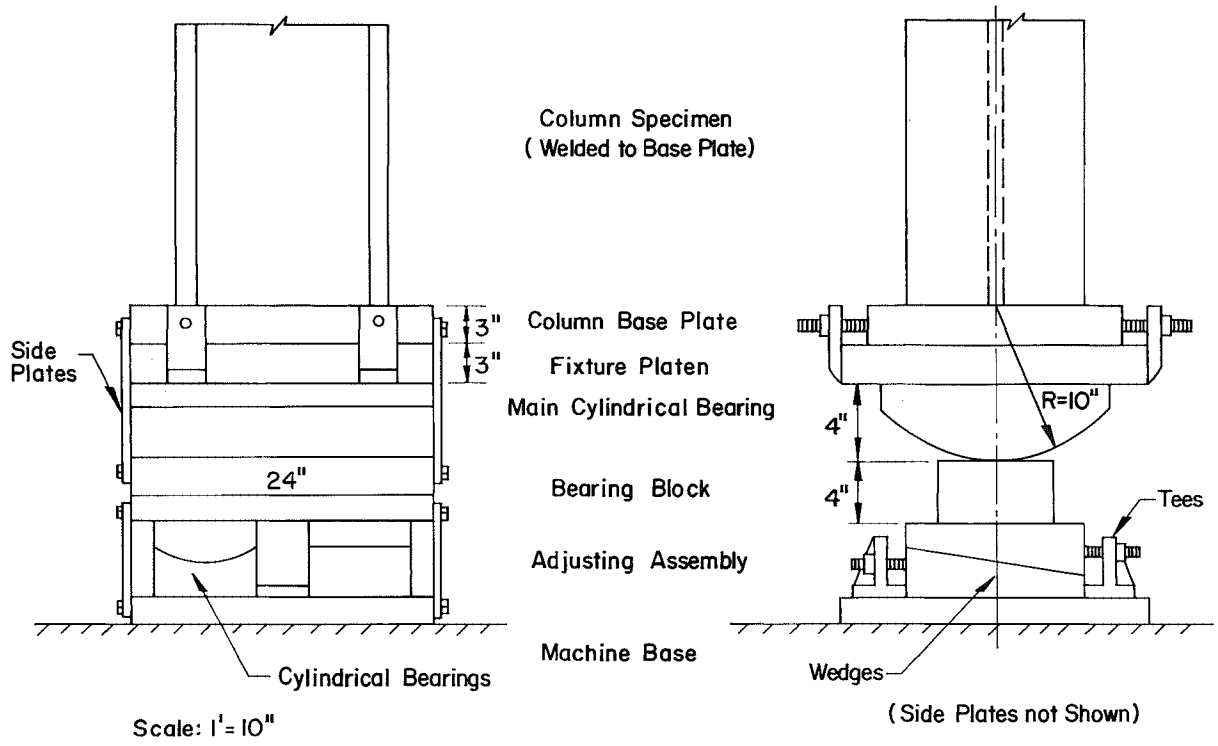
Standard Column End Fixture at Fritz Engineering Laboratory
